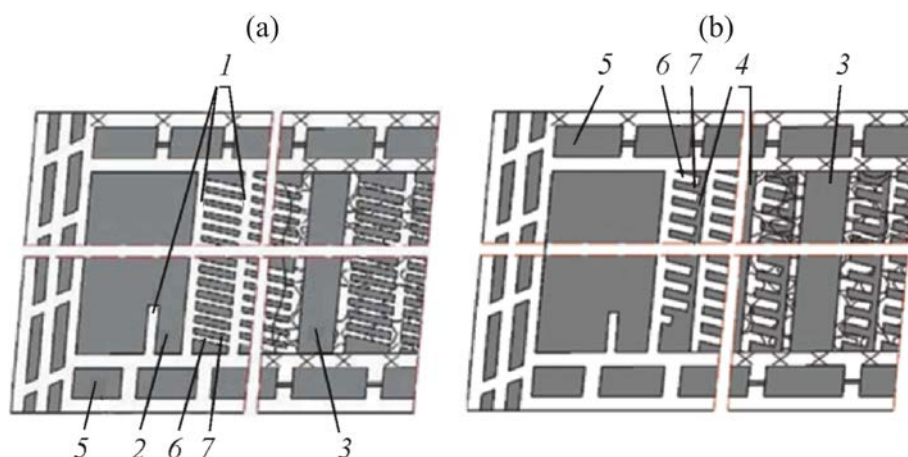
Room and pillar mining flow charts: (a) through entry ways in pillars; (b) blind entry ways in pillars; 1—room; 2—extraction panel; 3—safety pillar; 4—rib pillars; 5—protective pillars; 6—entry way; 7—pillars protecting miners and machines from roof fall.
